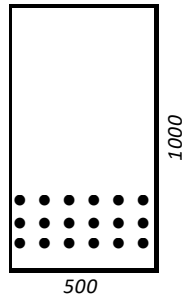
Schematic arrangement of longitudinal bars in the girder
